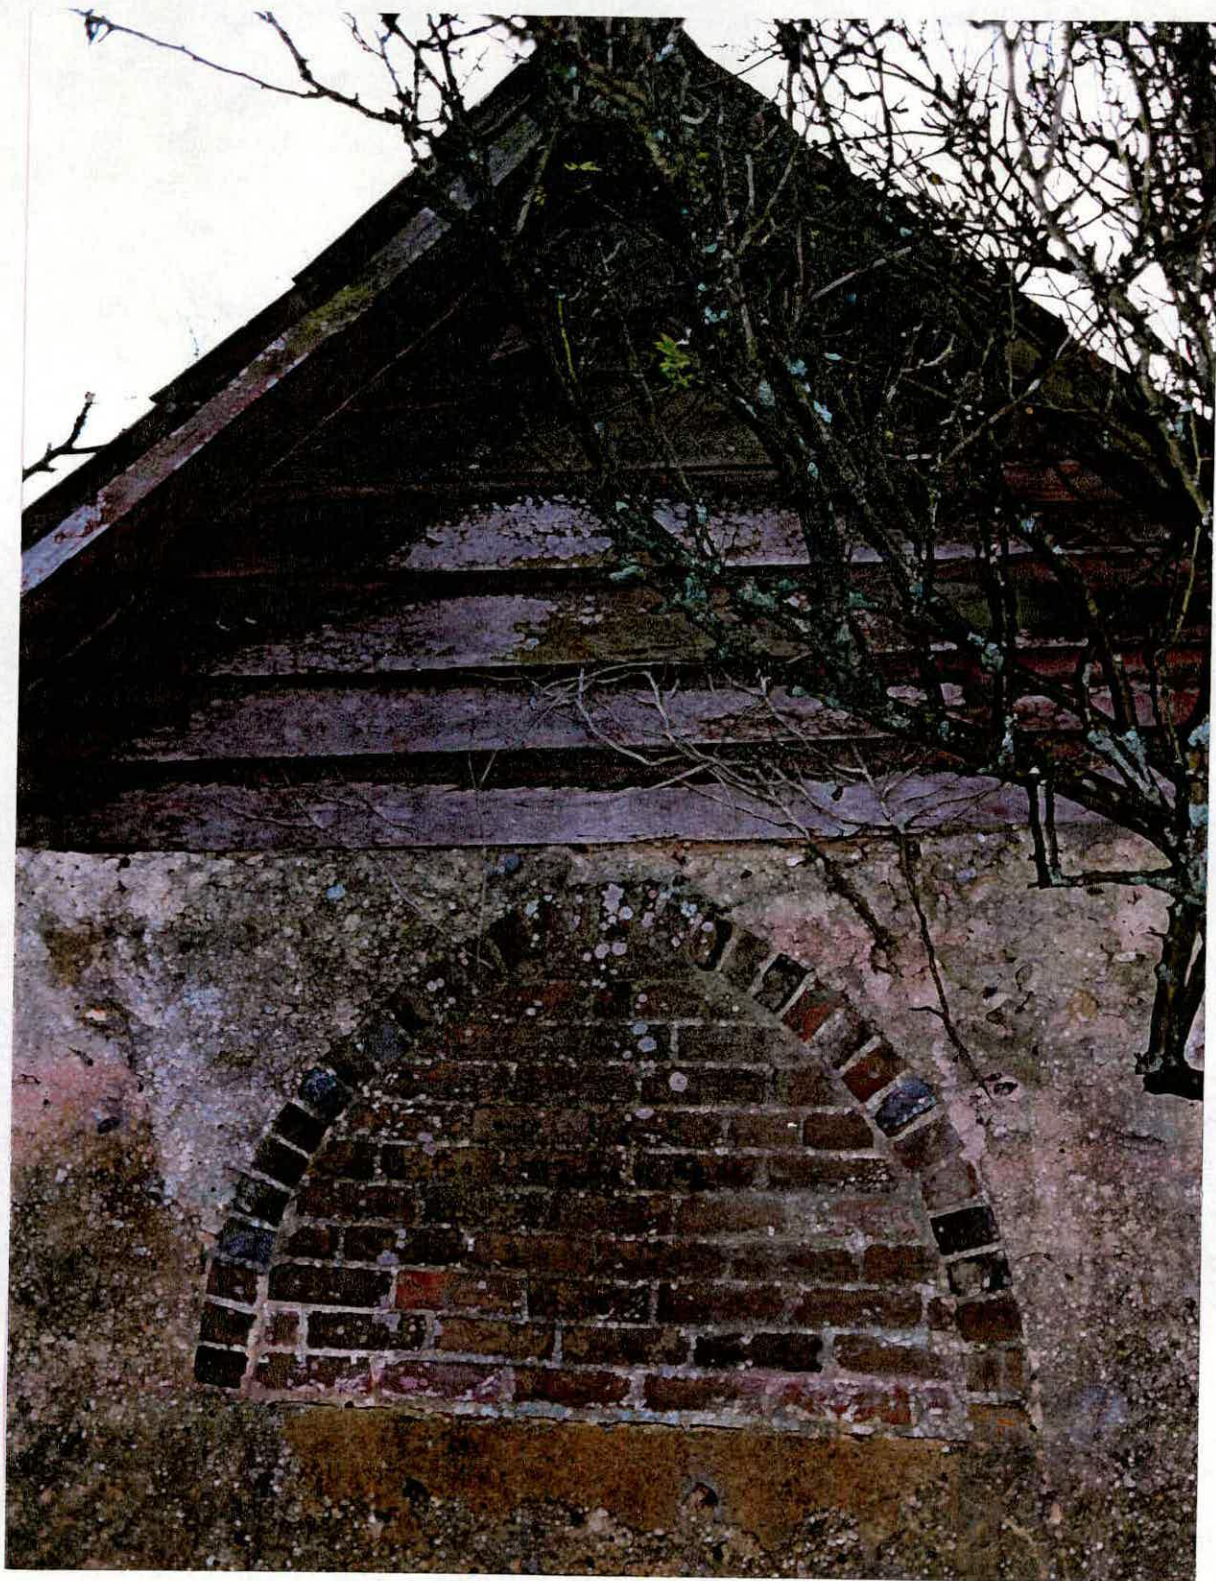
Detail of the blocked window in the north wall of the chapel. The weatherboarding may reflect a secondary reroofing of the building.
